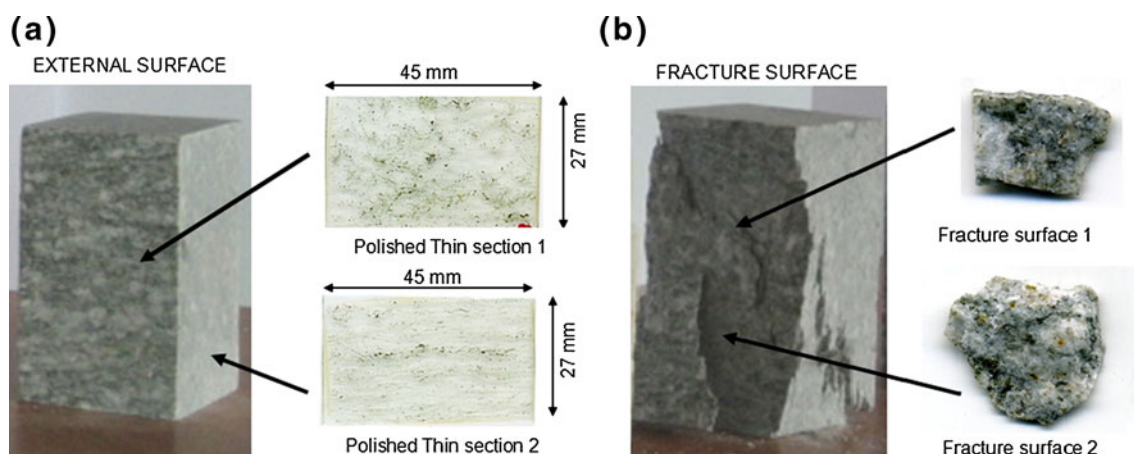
(a) Polished thin sections obtained by the external surface of an integer and not fractured portion of the tested specimens [1, 3]. (b) Fracture surface belonging to the tested specimens [1–3]
